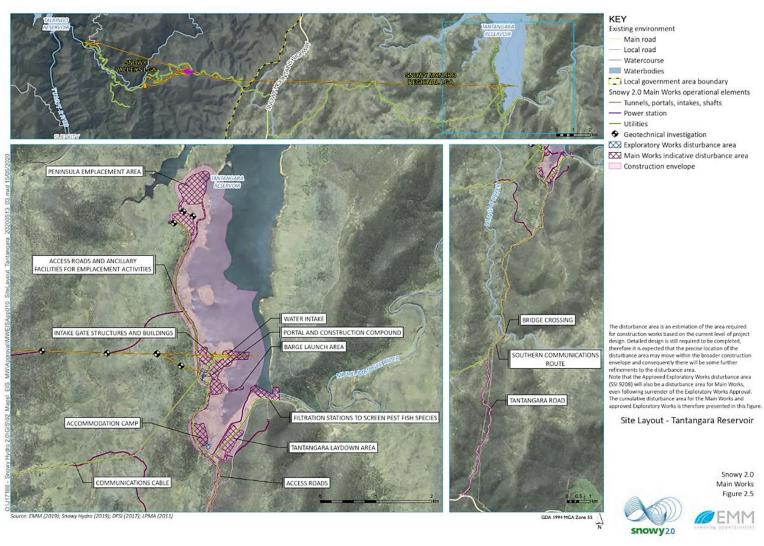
Construction areas – Tantangara (Infrastructure Approval Appendix 2)
